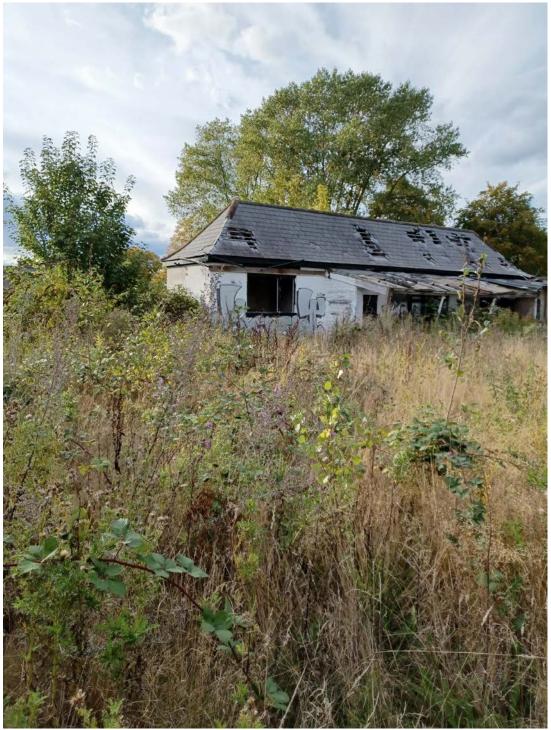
View from Brookhill Road looking west (the site is on the left side)
